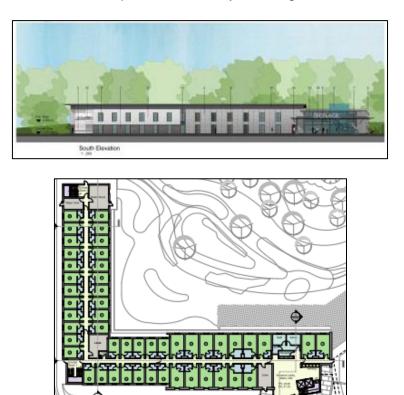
Front elevation of lodge and ground floor plan (first floor plan is very similar).
